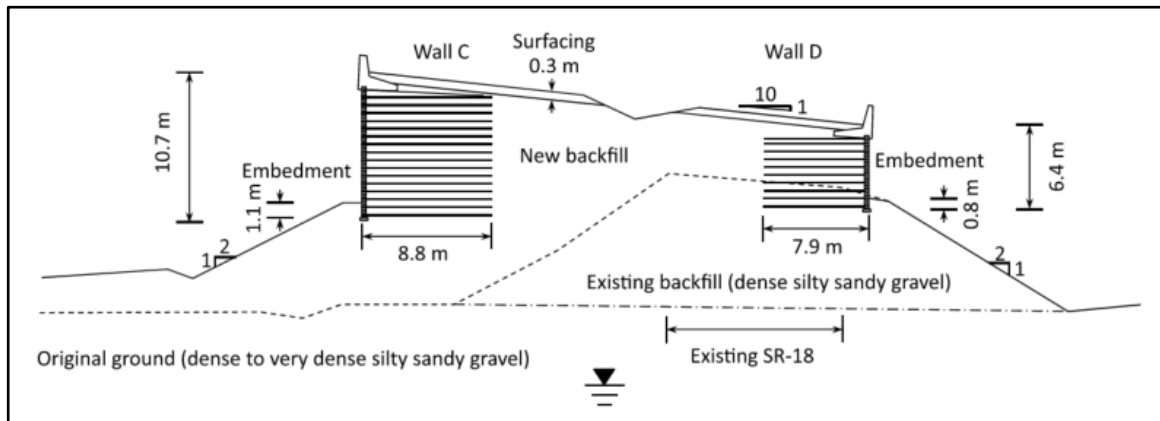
CROSS SECTION OF HISTORICAL SR-18 MSE WALL CONFIGURATIONS
